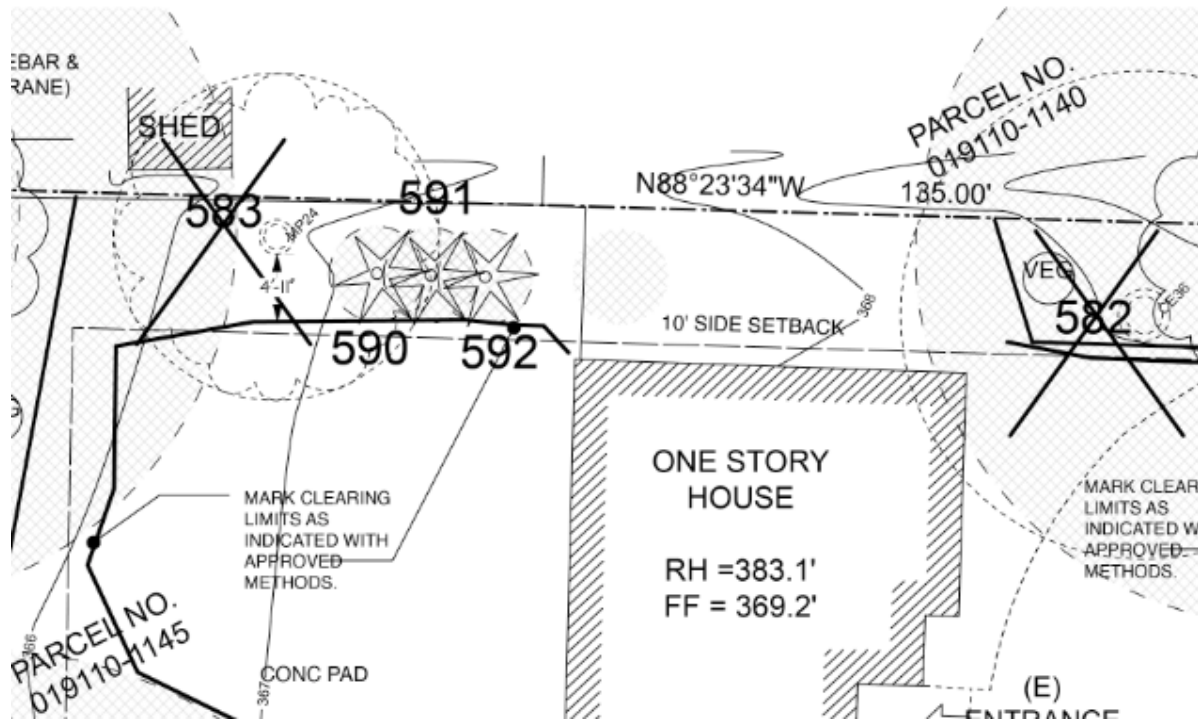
Excerpt from the 'Existing Site Plan' sheet showing locations of the subject trees.
